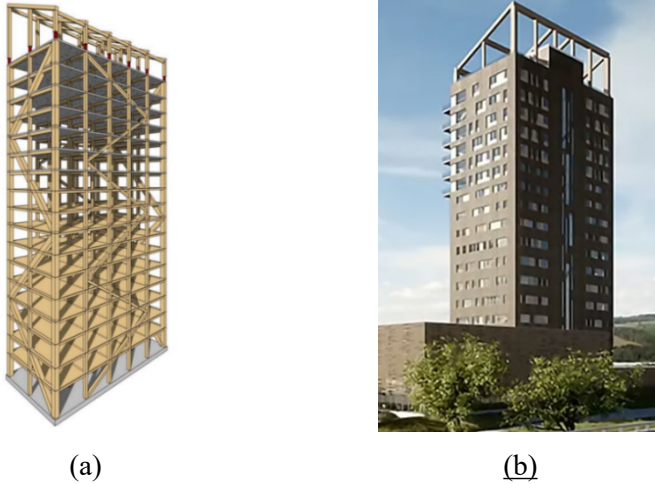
(a) Industrial wooden load-bearing system, (b) façade perspective of the building (Tupénaitė et al., 2019)
